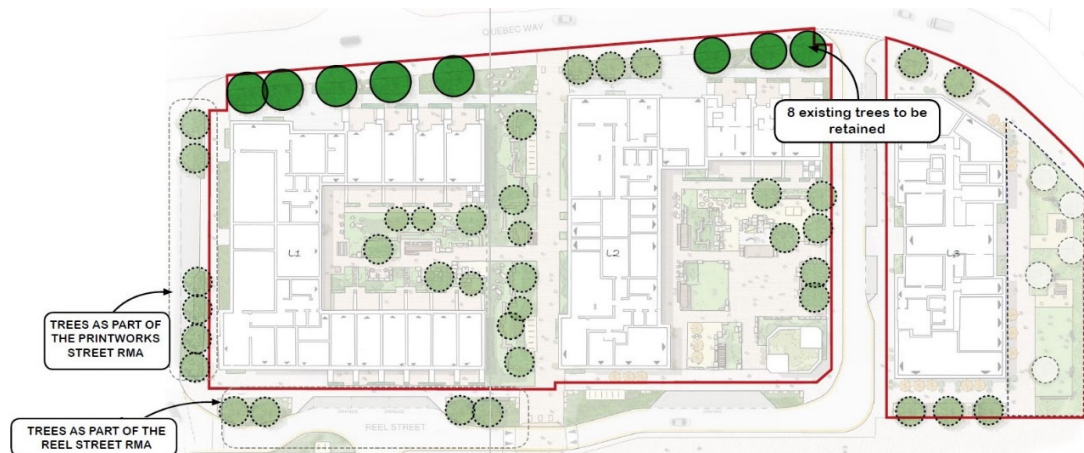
(above): Plan showing the existing trees to be retained (dark green), new permanent trees to be planted (mid green) and the temporary trees at Park Walk (light green).
